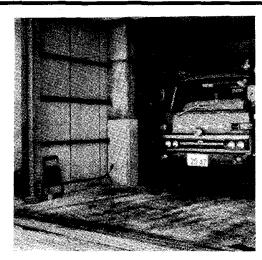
Fire station in Sendai, Japan. The opaque side walls are constructed as lightly clad braced frames, creating an overall framed structural system. The lighter frame structure reduces forces: the frame as a whole must be designed to keep drift down to acceptable limits.
